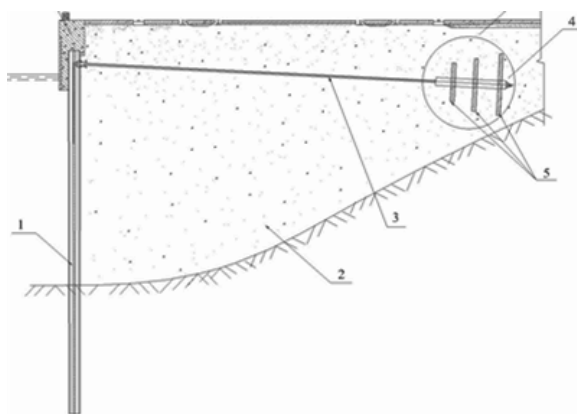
Anchored bulkhead with anchor bearer of new “comb” type: 1 – sheet piling; 2 – backfilling; 3 – tie-rod; 4 – rigid core; 5 – anchor plates.
